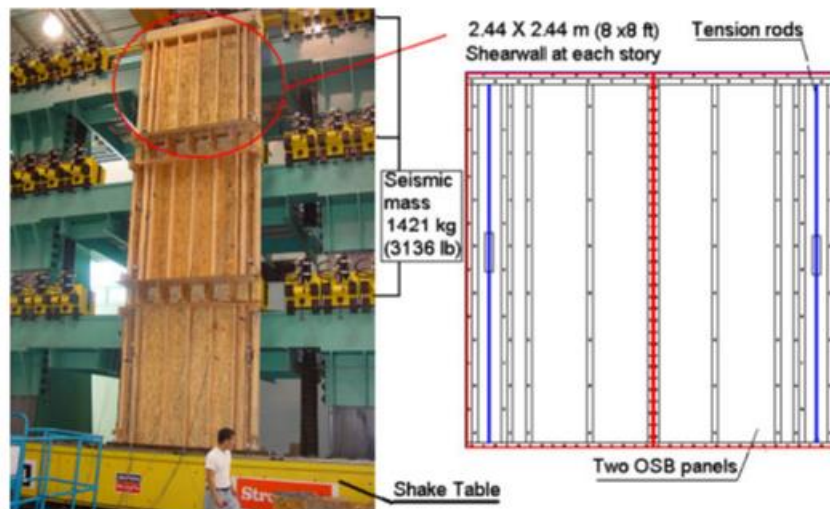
Three-Storey Shear Wall Test Configuration (S. Pei et. al. 2009)
